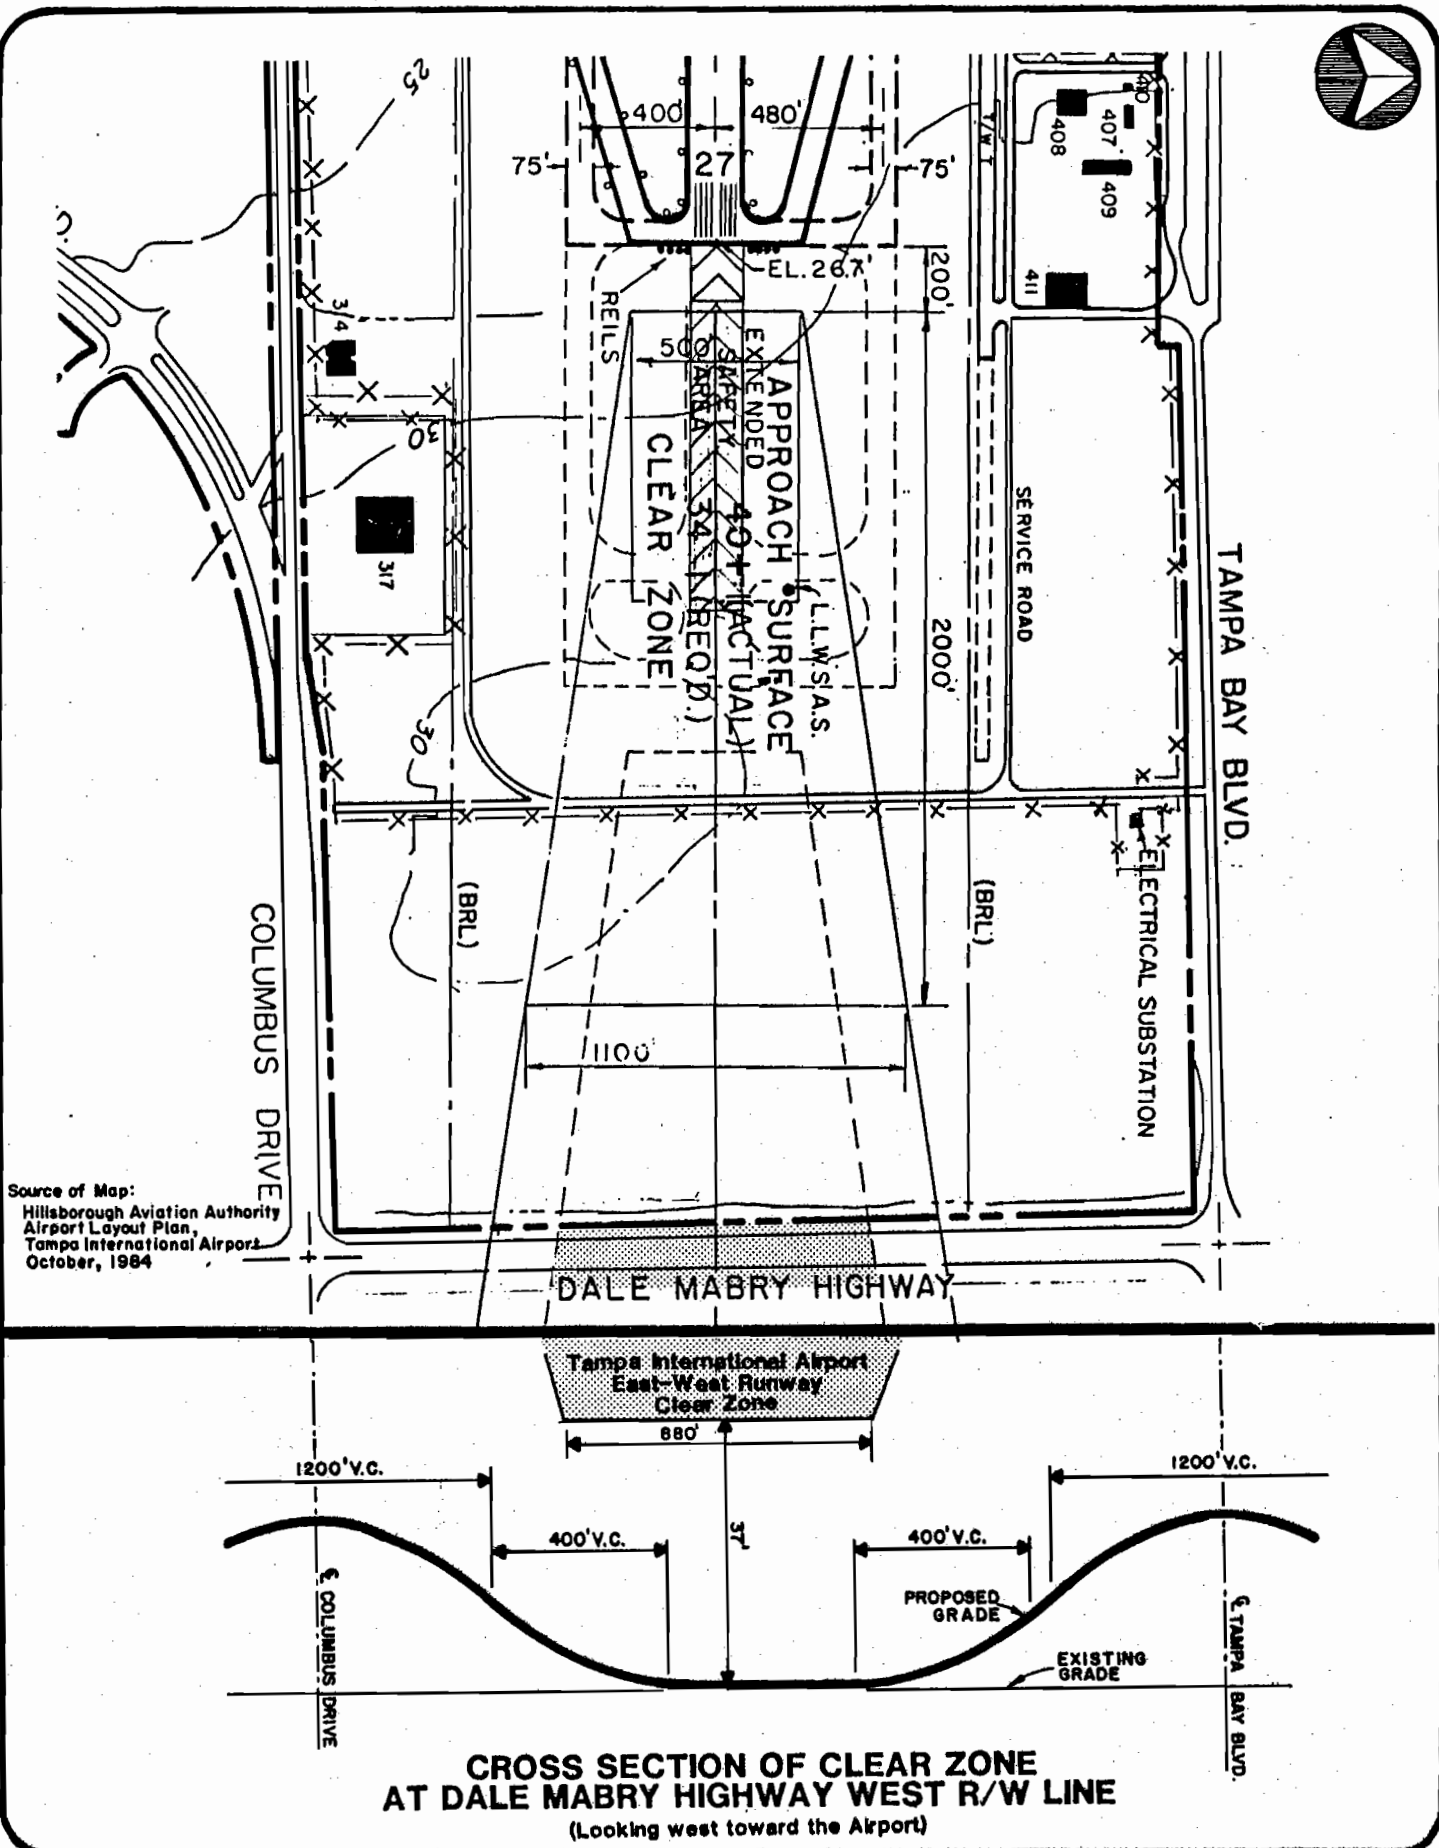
PLAN AND CROSS SECTION OF AIRPORT RUNWAY CLEAR ZONE
